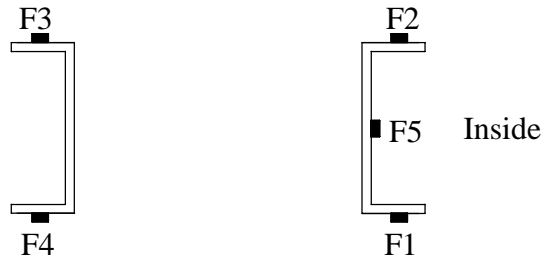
Field Test No.2 – Location of strain gages on member cross-sections
